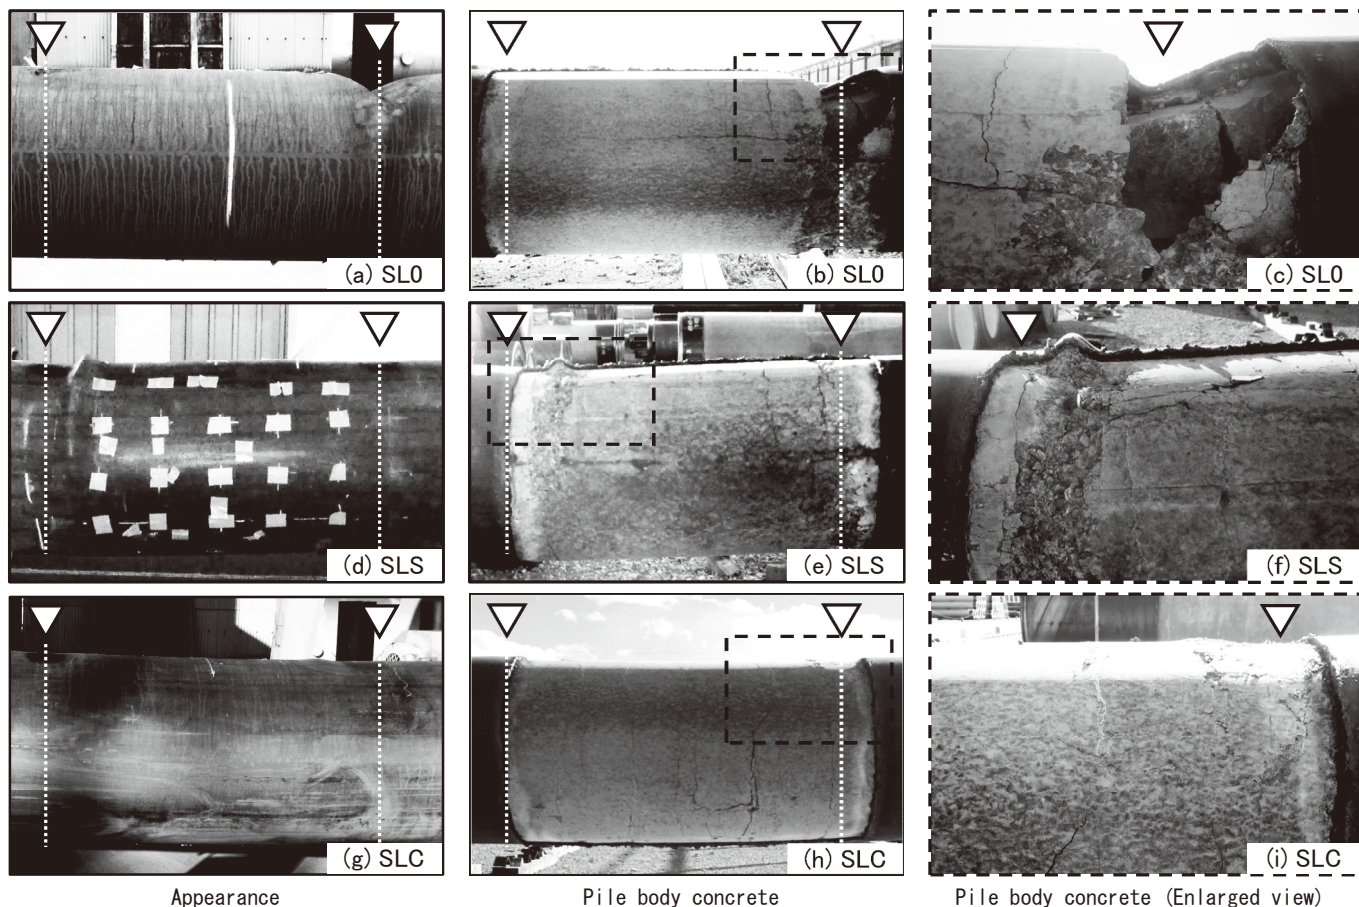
Failure condition between loading points (SL0, SLS, SLC)
